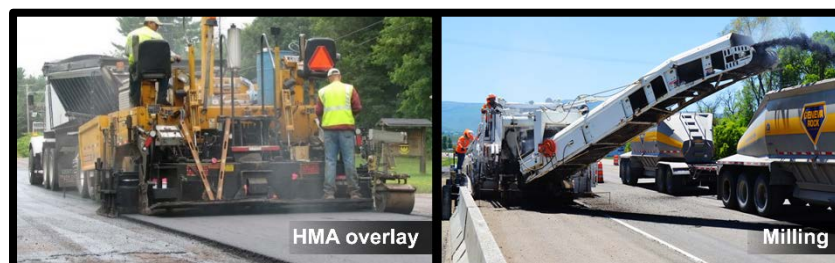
Examples of structural improvement treatments—(on left) HMA overlay on an unmilled pavement and (on right) milling of asphalt pavement.
